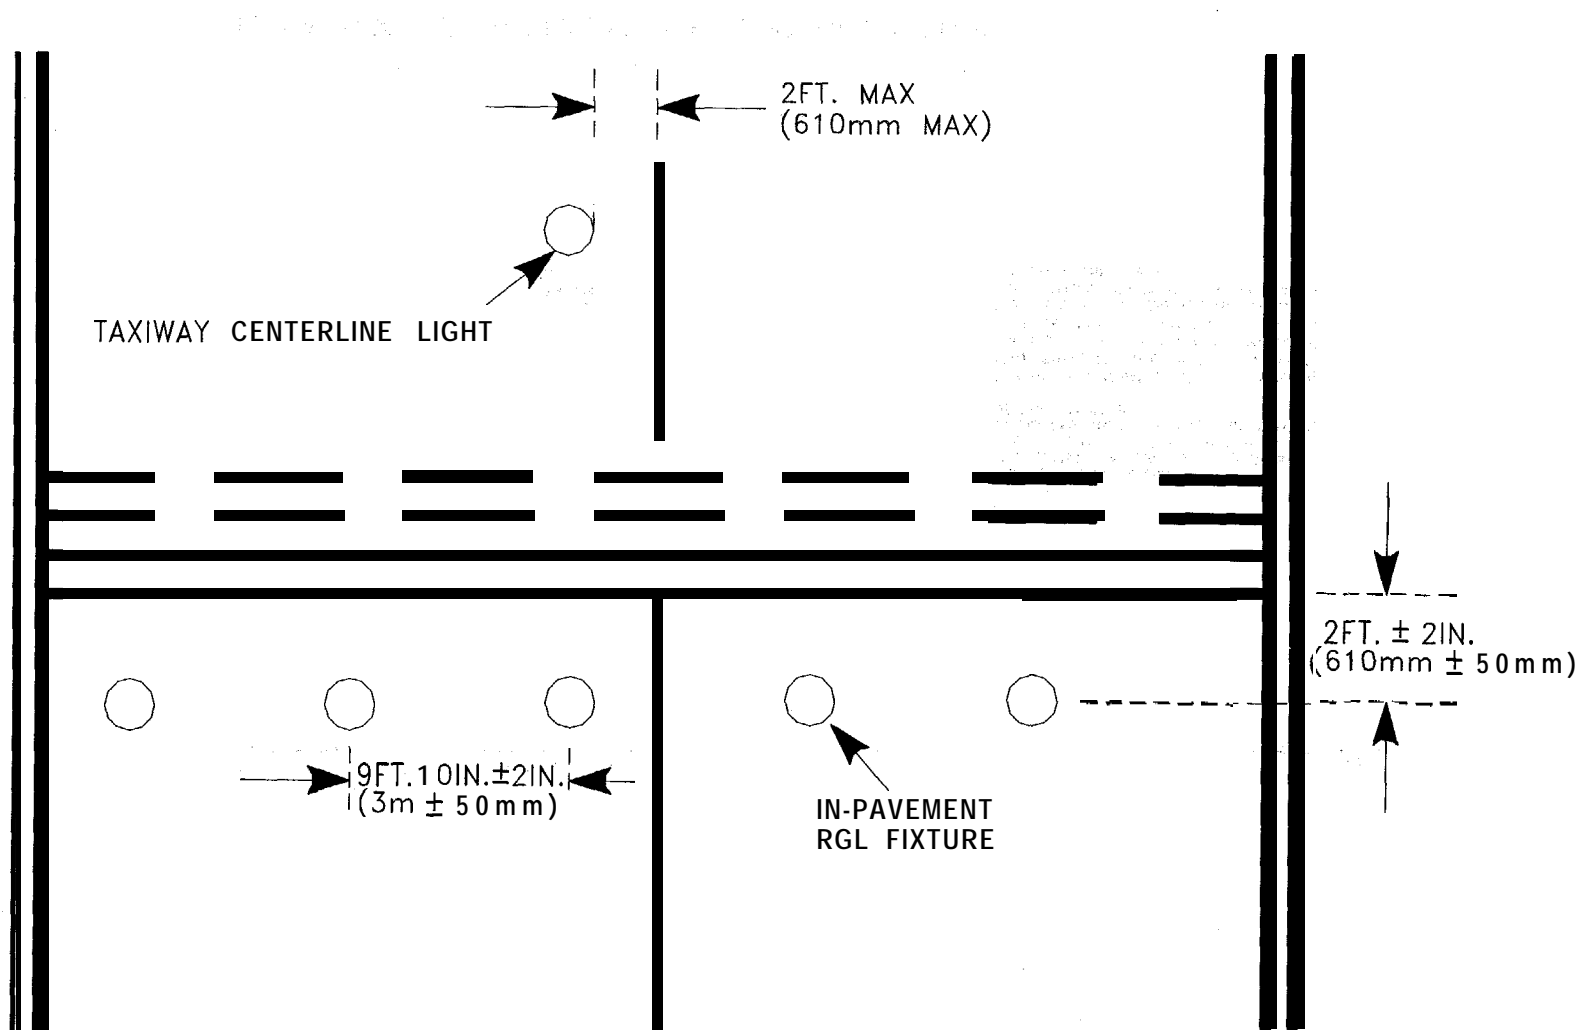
IN-PAVEMENT RUNWAY GUARD LIGHT CONFIGURATION
